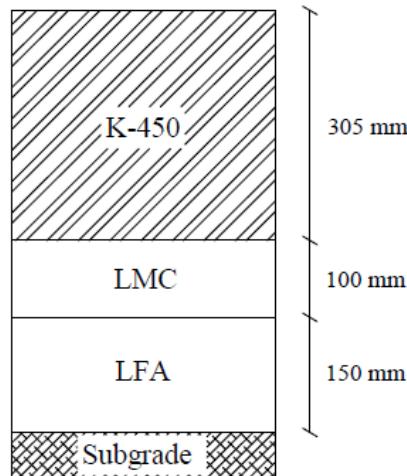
Rigid pavement design MDPJ 2017 and MDPJ 2024
